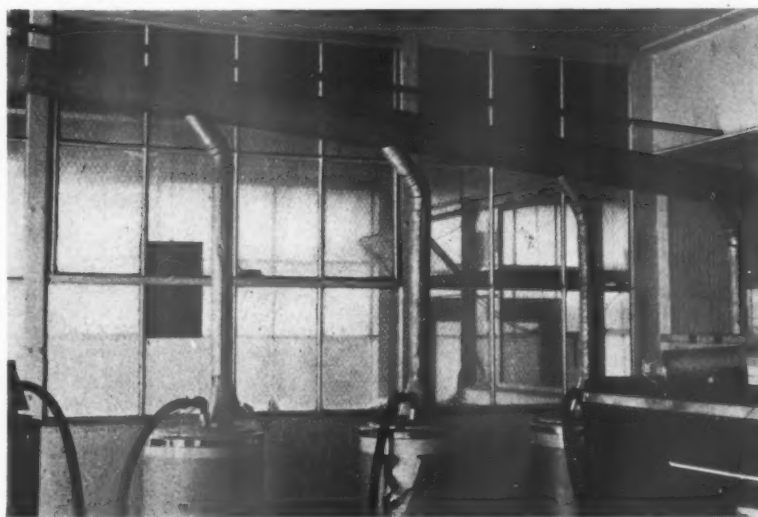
Bottom entry, 45° angle connection to 6" diameter header
